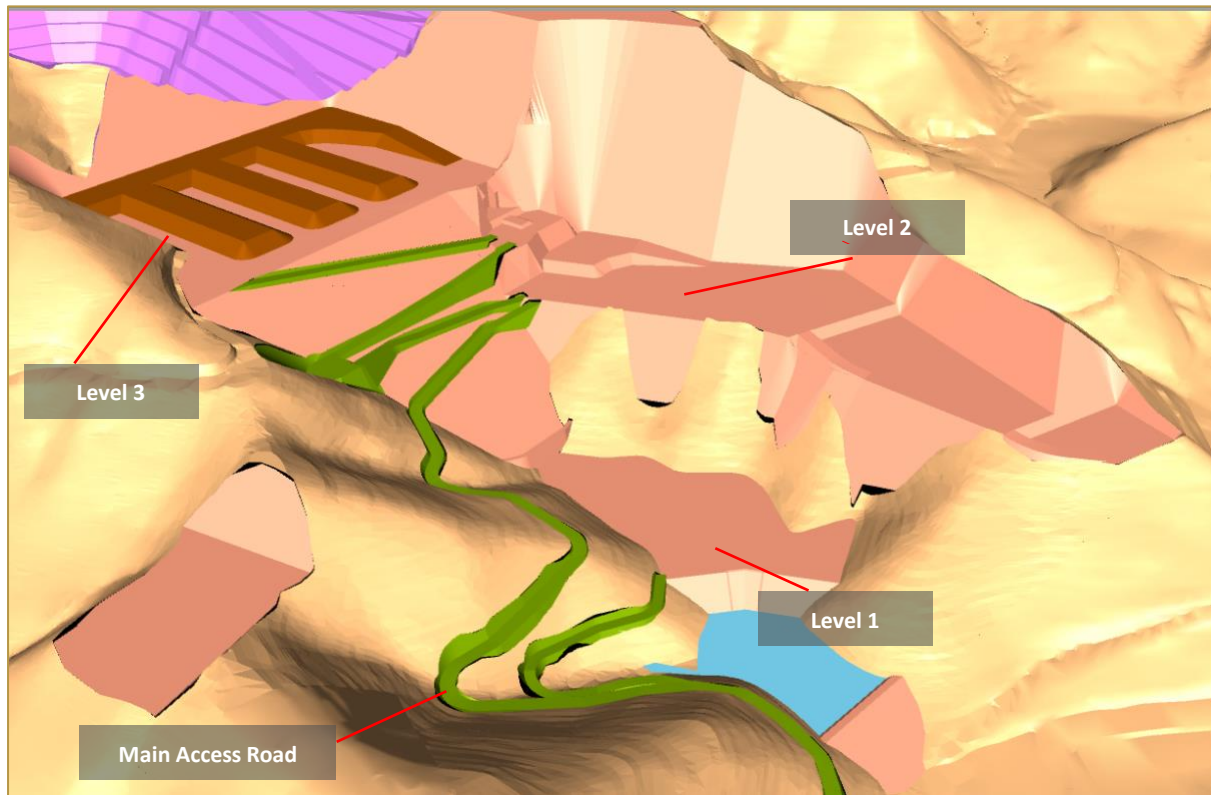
, Plant Earthworks Layout Oblique view looking south east
